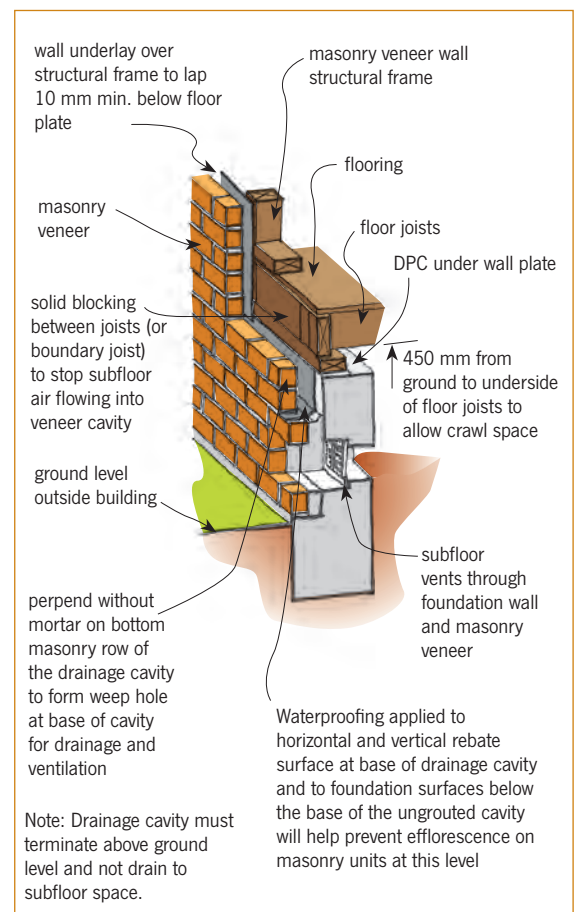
Veneer base –suspended timber floor and concrete foundation wall.
